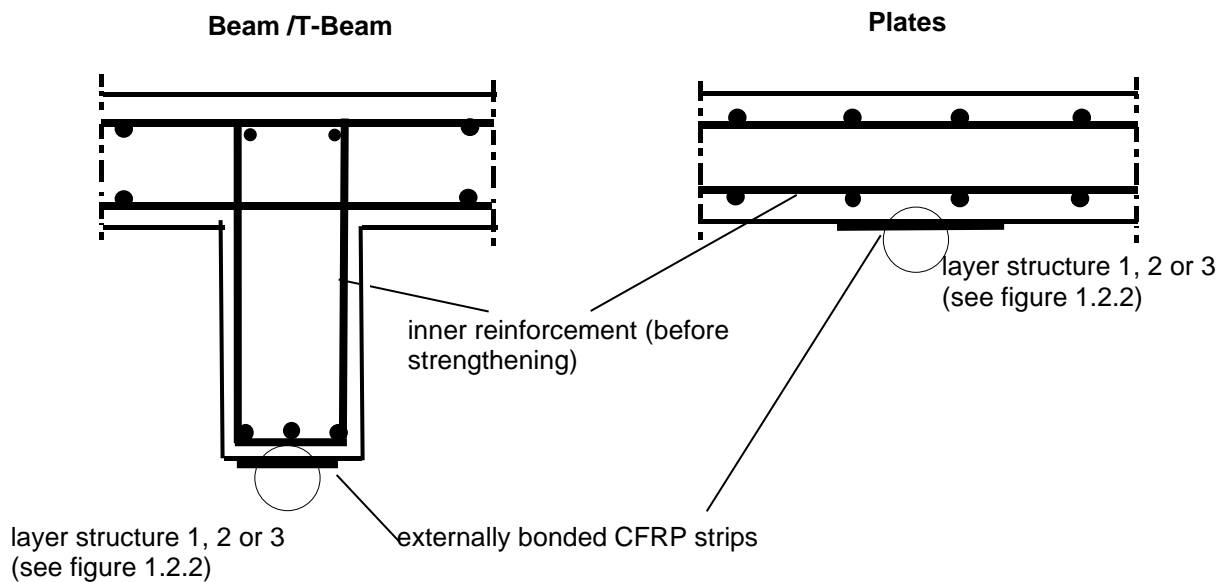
Principle sketches of reinforced concrete sections with subsequent strengthening by externally bonded CFRP strips
